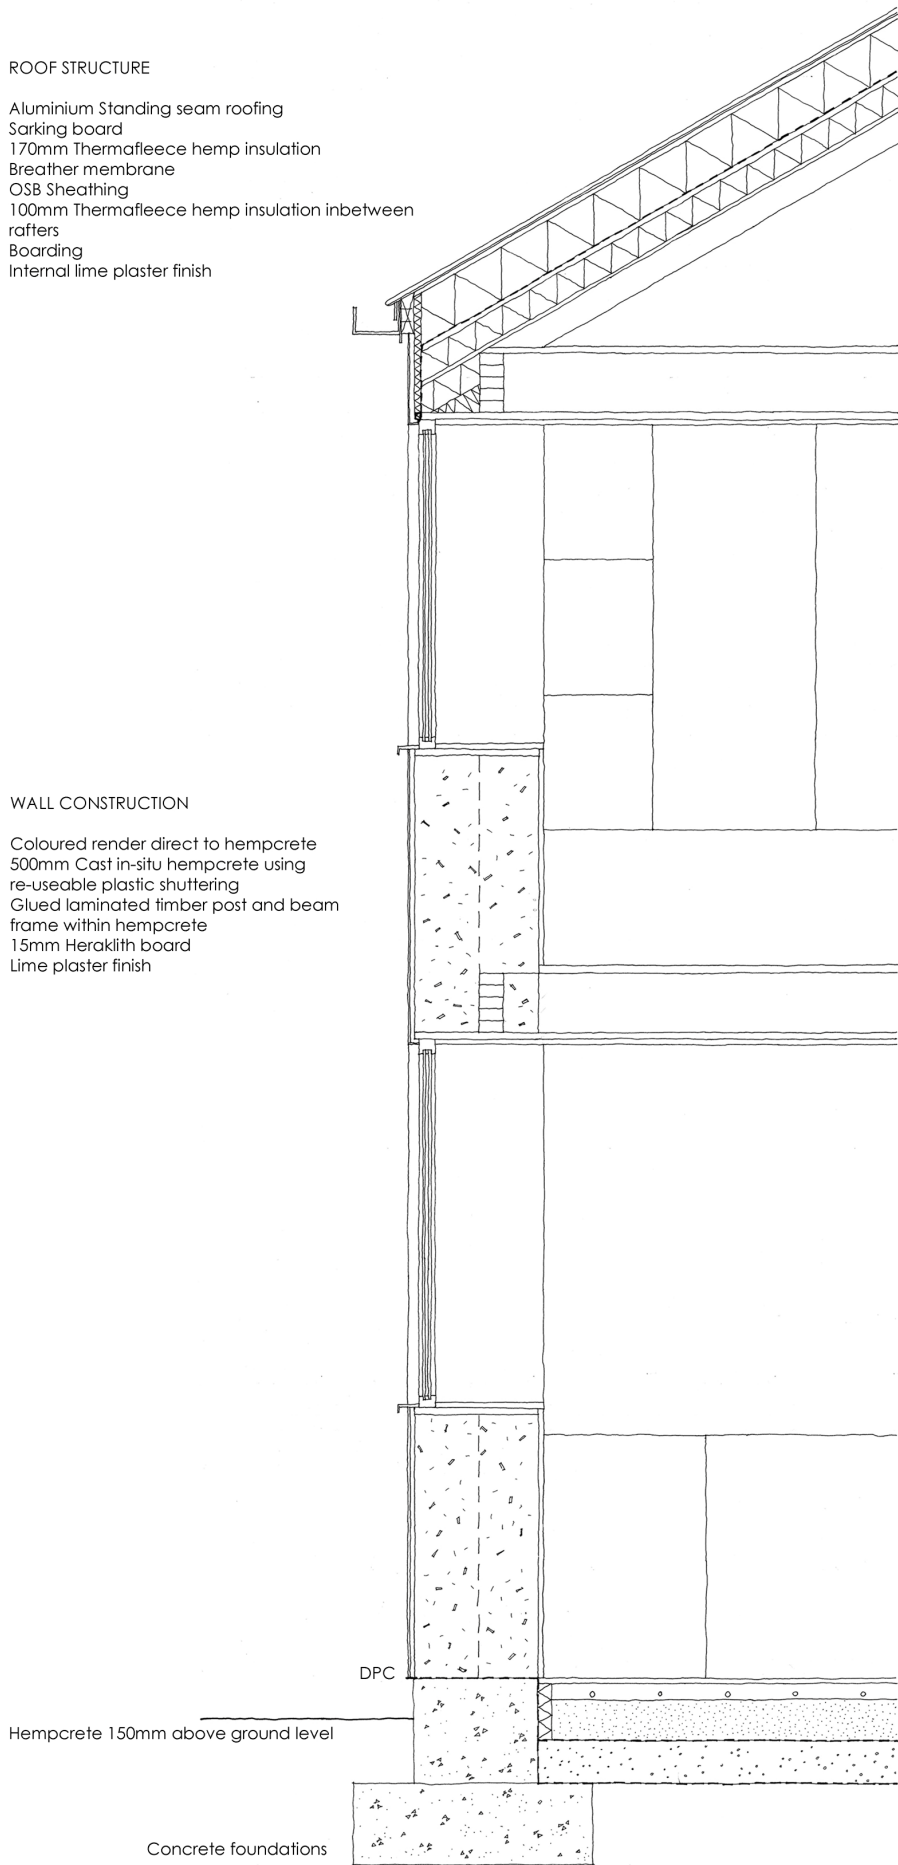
Construction section through living room through kitchen and bedroom of 3 bed house type
